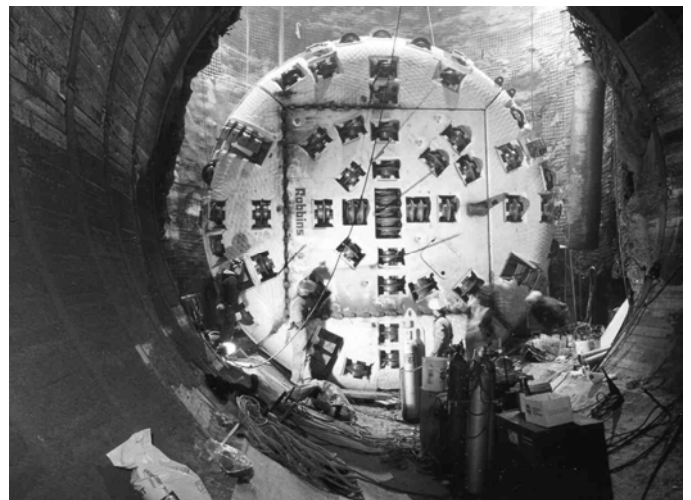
View of tunnel boring machine-cutting head in the tunnel
